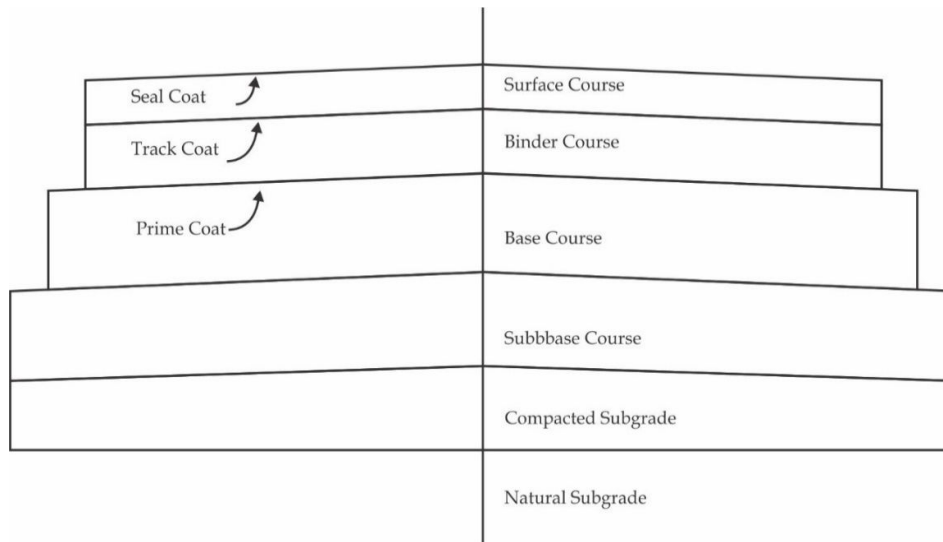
Typical Cross Section of the Layered System in Conventional Flexible Pavement
